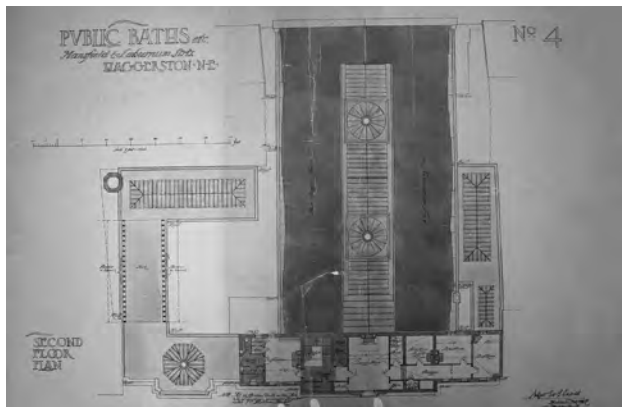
Second Floor plan. HA: S/EP/5/1-9
